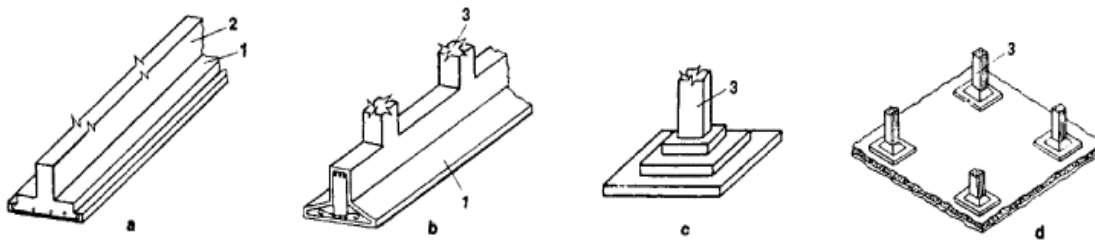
Cast shallow foundations: (a) continuous under a wall, (b) continuous under columns, (c) isolated under a column, (d) combination under columns; (1) lower continuous footing of reinforced concrete, (2) foundation walls (3) column size.
